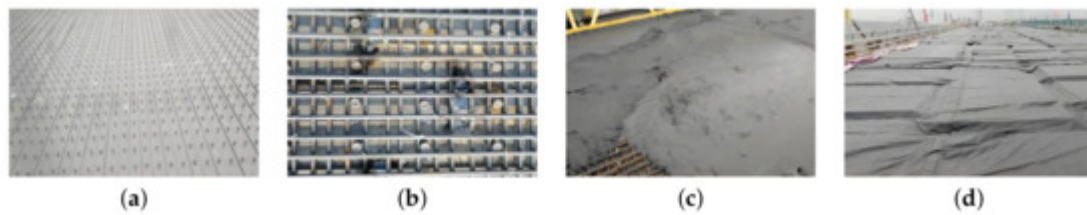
UHPC construction process: (a) Welded shear stud; (b) Steel mesh; (c) Pouring UHPC; (d) Steam curing.
